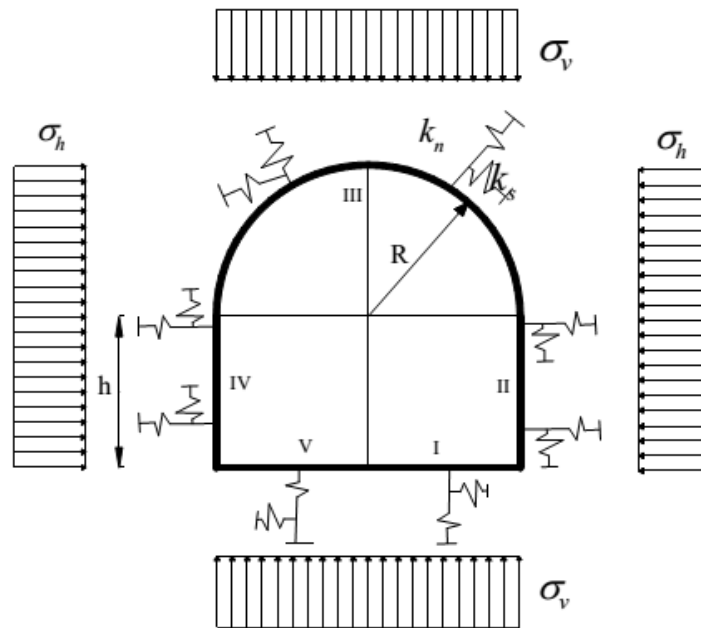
Calculation diagram of tunnel lining with the HRM method in case the U-shaped tunnel lining σ_v -vertical load in the model tunnel–surrounding soil; σ_h -horizontal load in the model tunnel–surrounding soil; k_n -normal stiffness of the interaction springs; k_s -tangential stiffness of the interaction springs; R -tunnel radius; EJ and EA -bending and normal stiffness of the tunnel lining.
